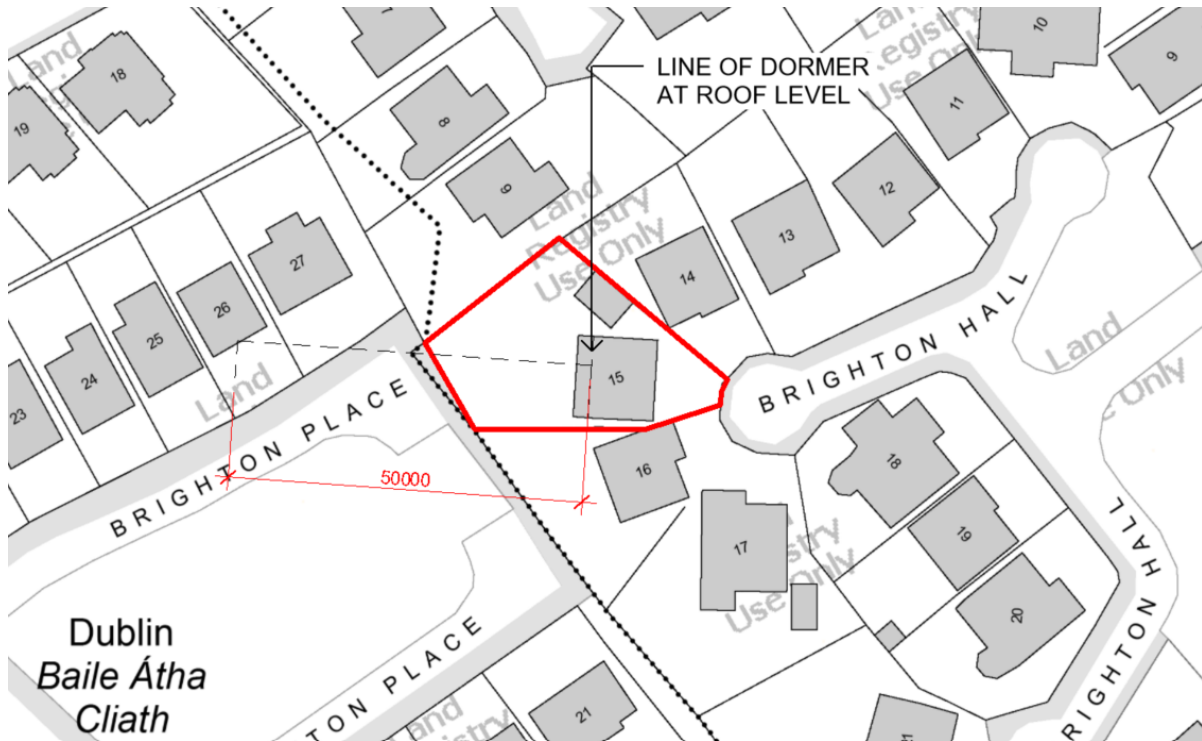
Extract from site location plan showing distance from neighboring buildings to rear.
